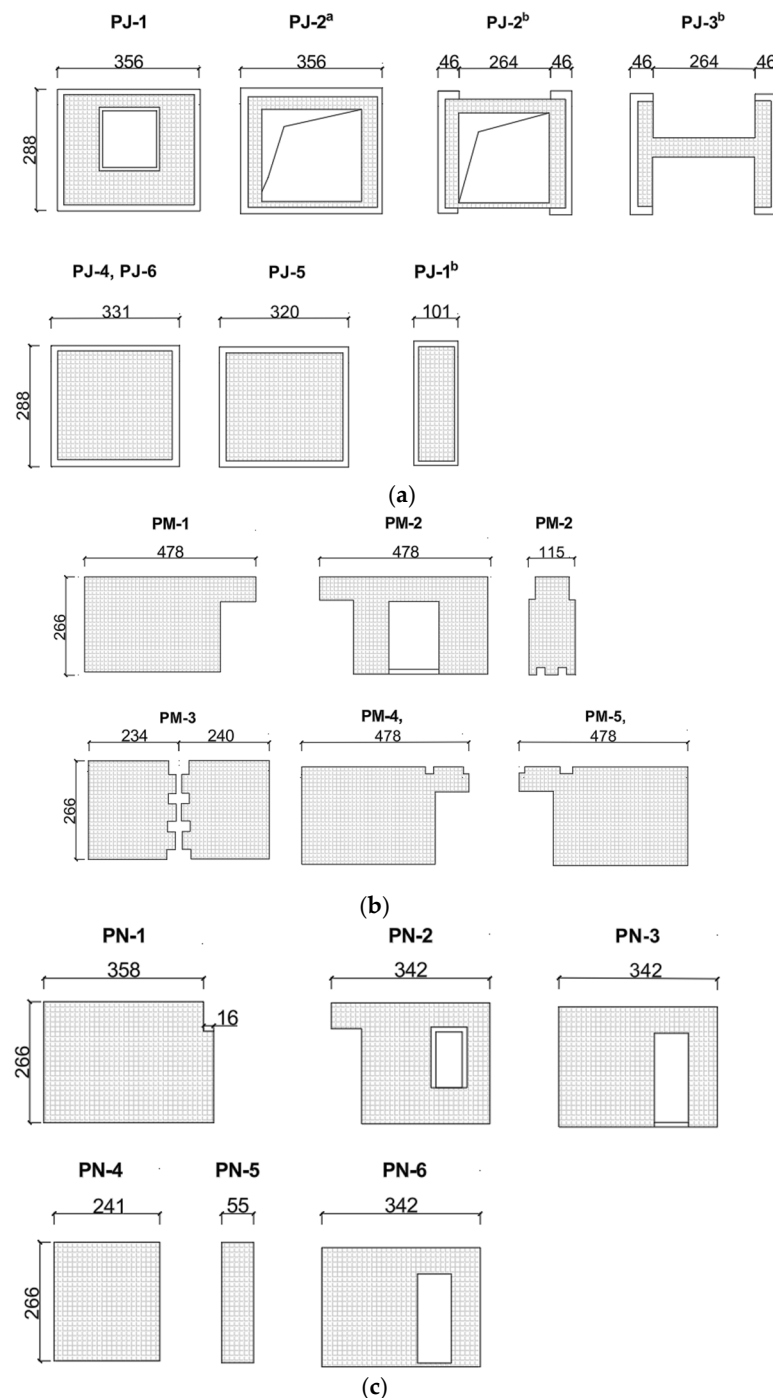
Classification of precast RC wall panels: (a) an exterior wall panel (PJ); (b) an interior load-bearing wall panel (PM), and (c) interior partition wall panels (PN) (all dimensions in cm).
